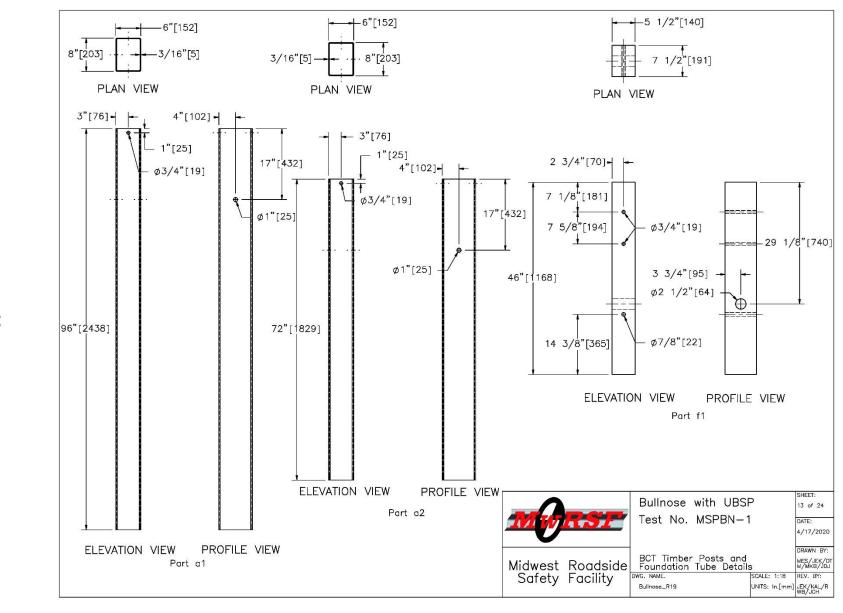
BCT Timber Posts and Foundation Tube Details, Test Nos. MSPBN-1 through MSPBN-3
